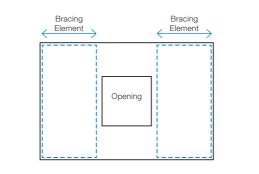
LARGE OPENINGS AND BRACING ELEMENTS
